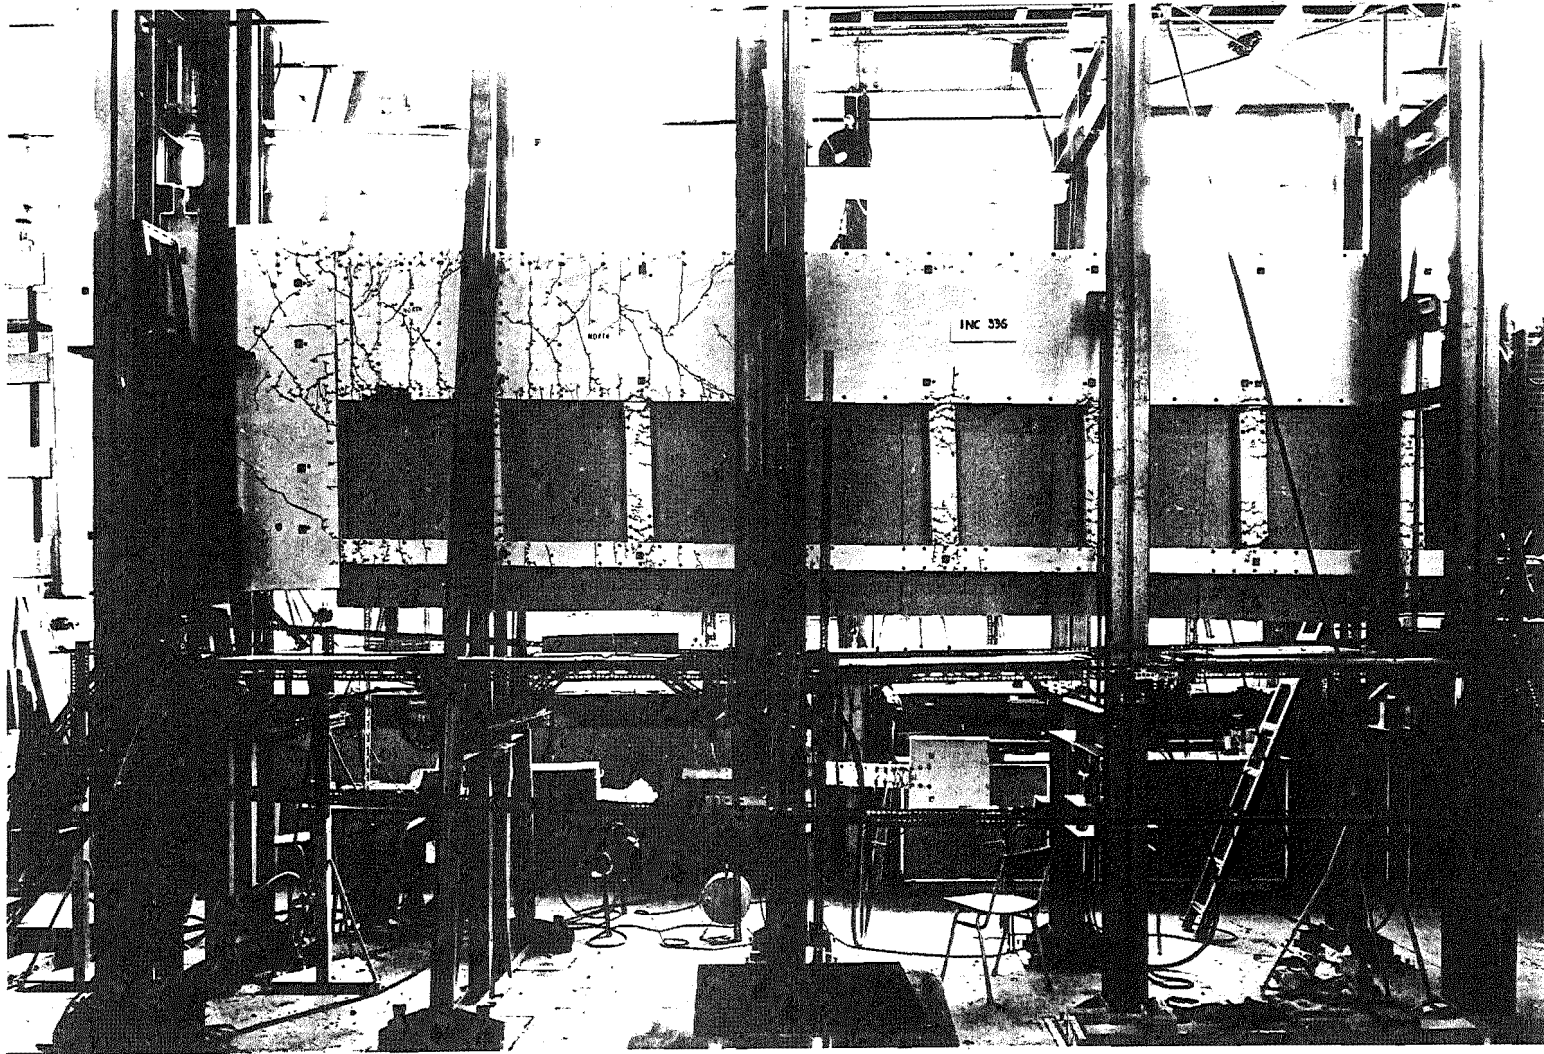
TEST RIG WITH SPECIMEN IN POSITION (SPECIMEN FSW-1, AT PEAK OF LOAD REVERSAL 18)
